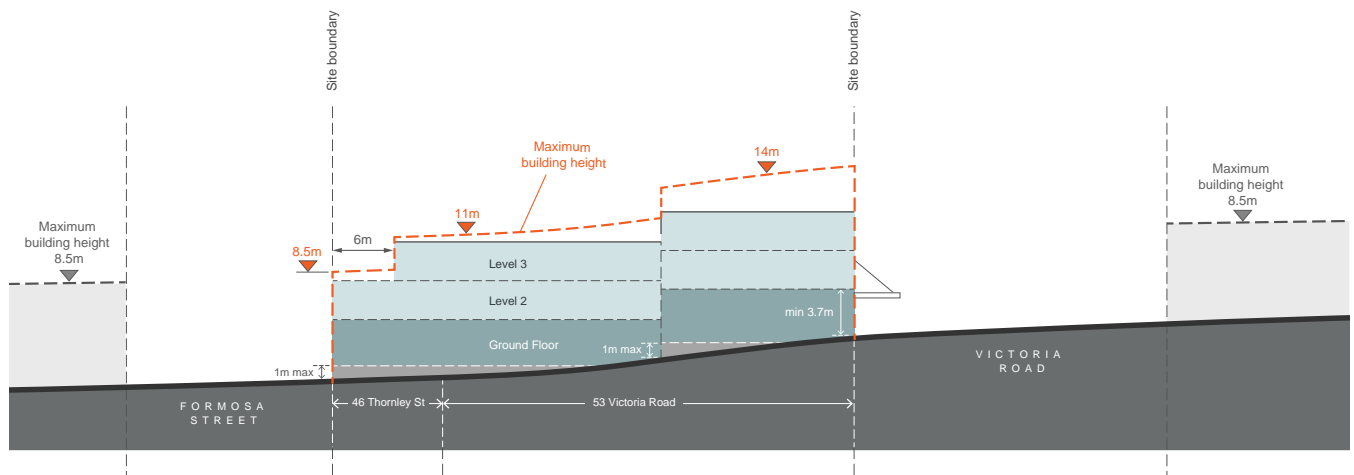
Area 'H' Elevation 3 Thornley Street
